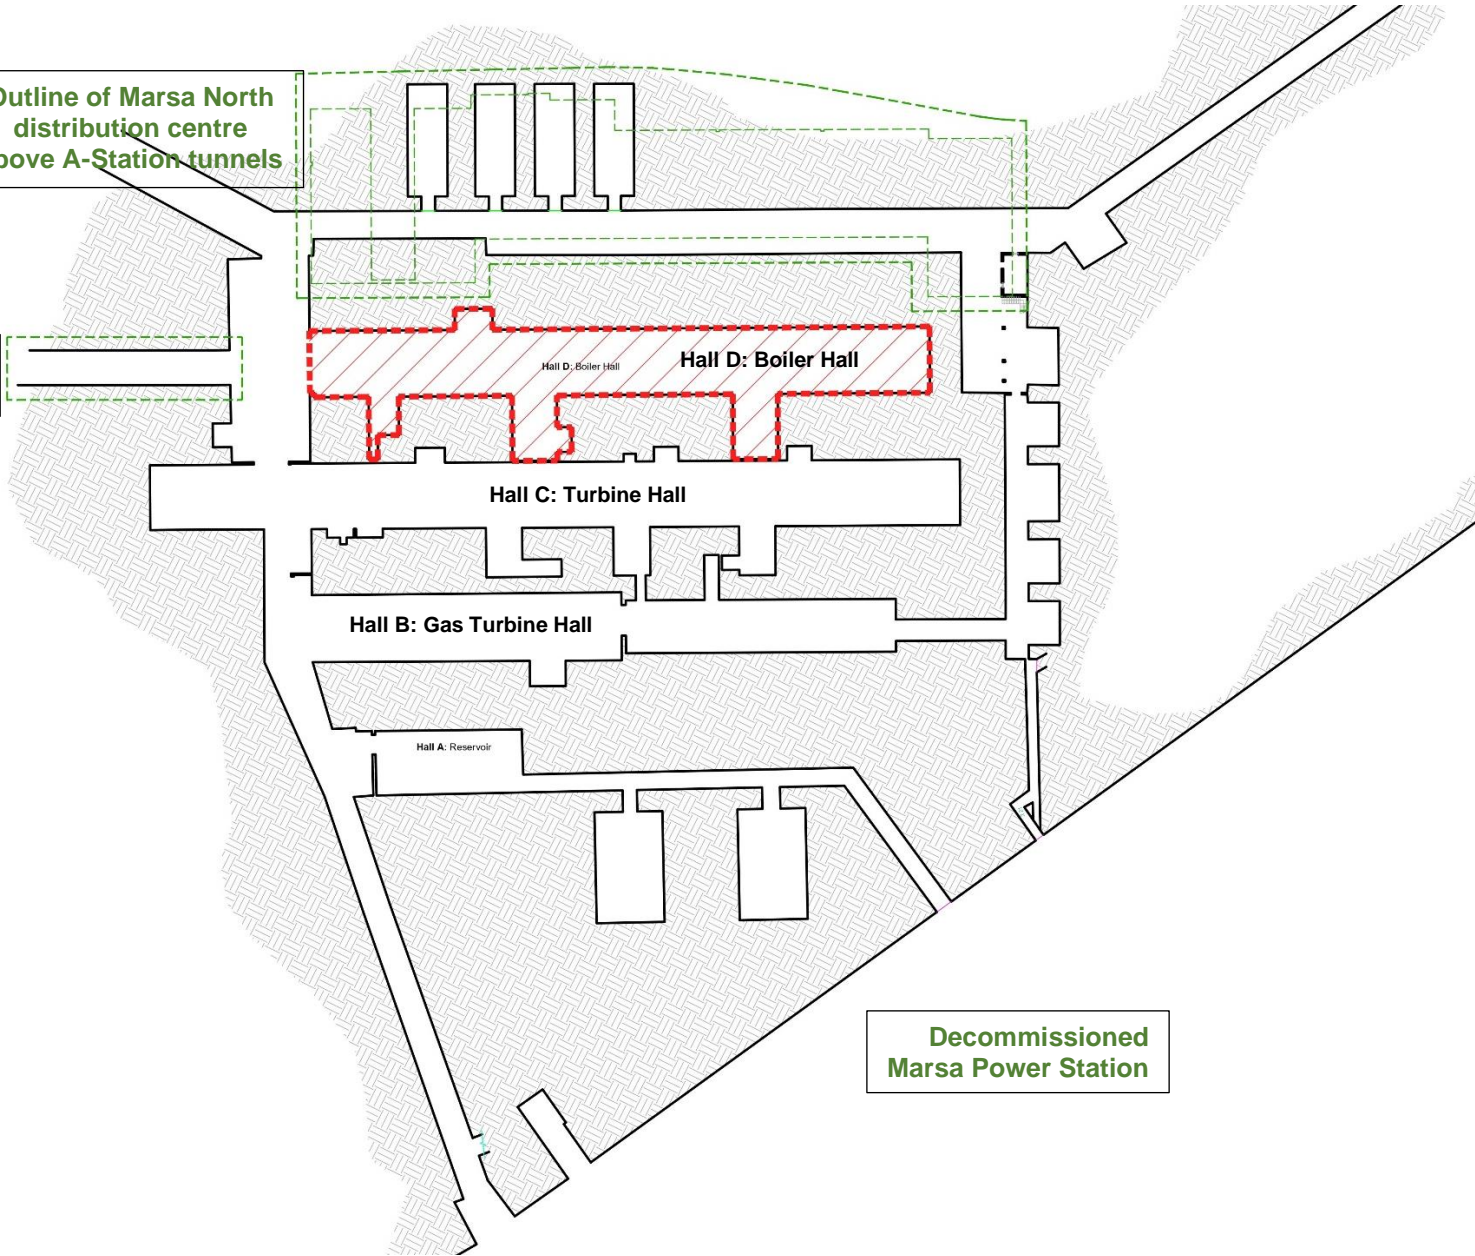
Preliminary layout plan within the Boiler Hall of the A-Station
